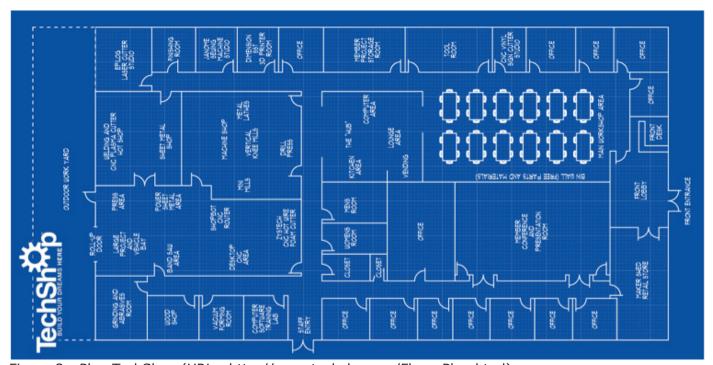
Plan TechShop (URL: http://www.techshop.ws/Floor_Plan.html)
